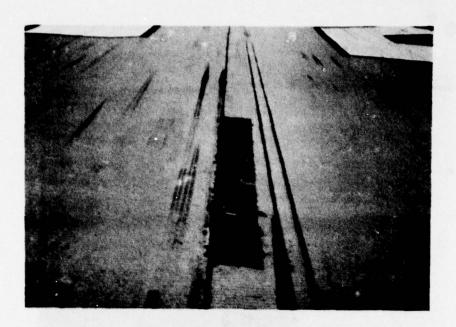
Isolated Patch of Distressed Longitudinal Joint Midway Airport
